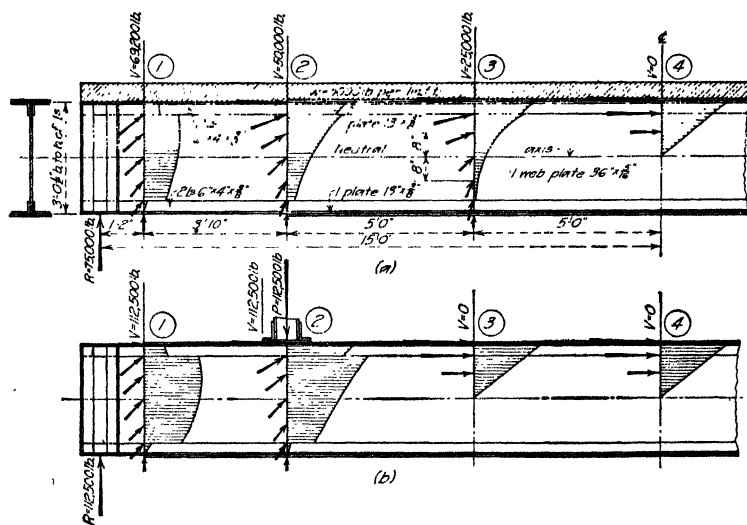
Diagonal compressive stresses at various sections on typical plate girders
